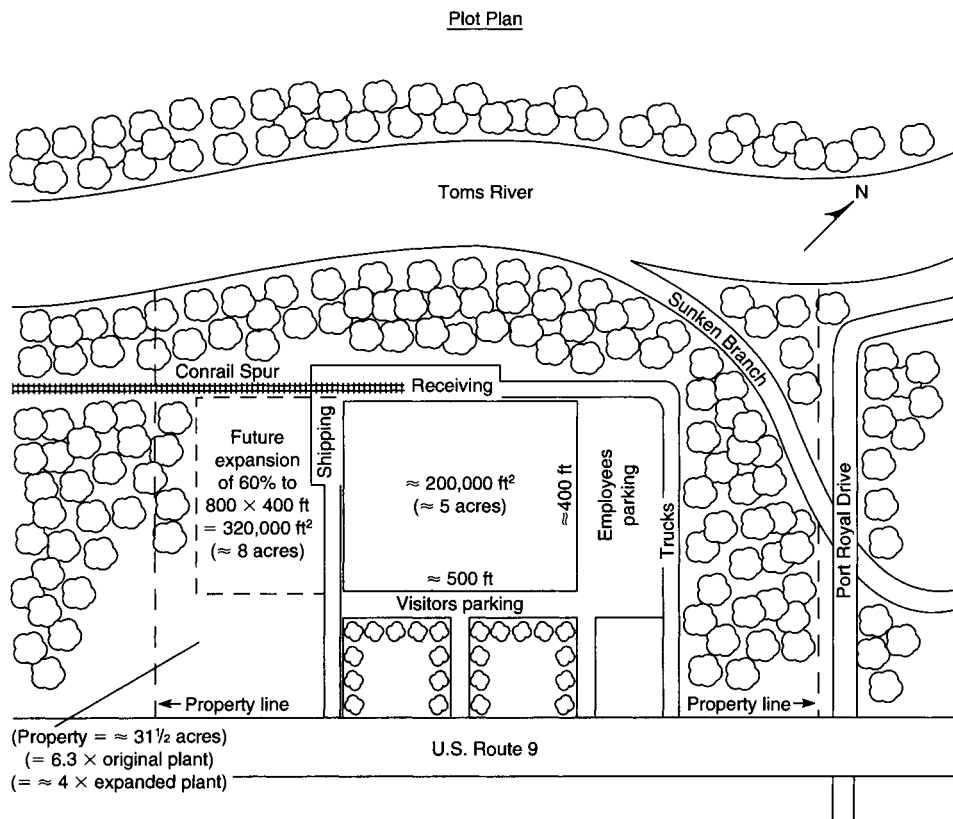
Plot plan of an industrial plant. (Source: VMA, Inc.)
